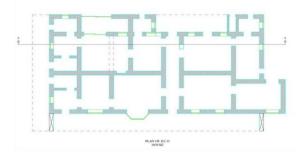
Commissioner House AutoCAD Plan Source: Author
